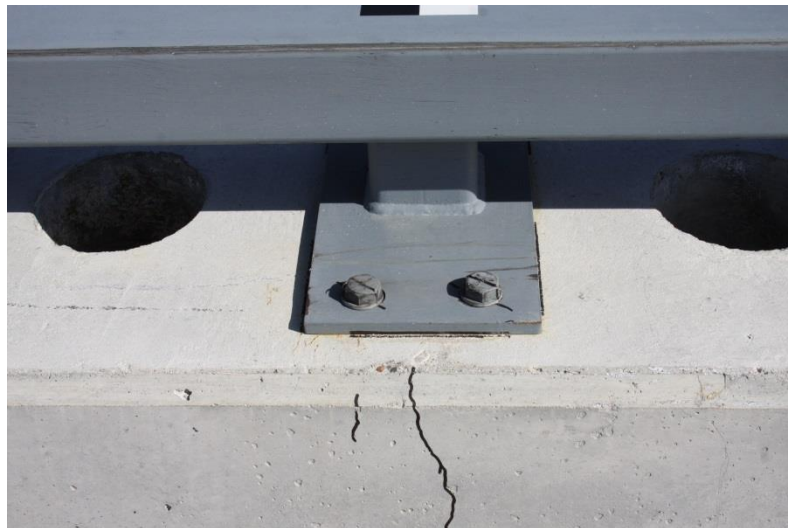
System Damage, First Upper Tube Assembly Connection Upstream from Joint between Barrier Nos. 6 and 7, Test No. SFH-3
